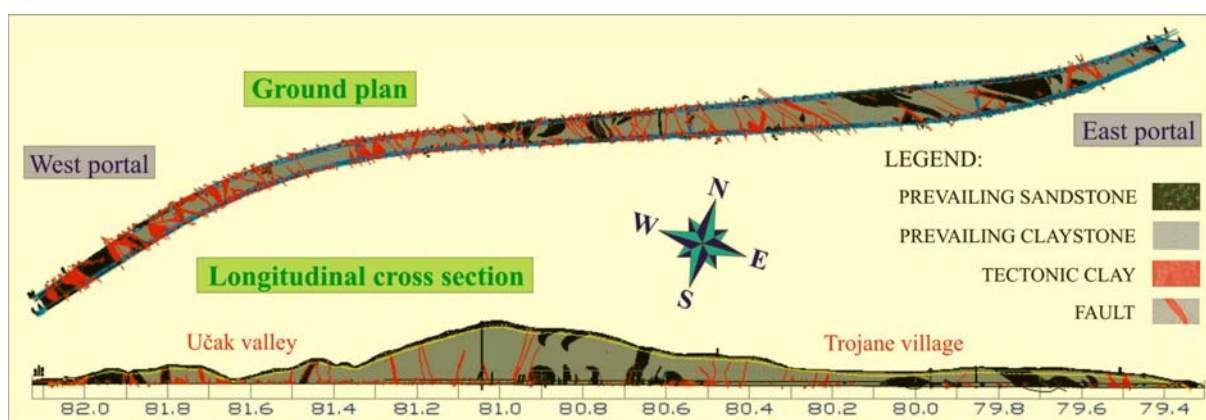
Geological ground plan and longitudinal cross section of the Trojane tunnel.
